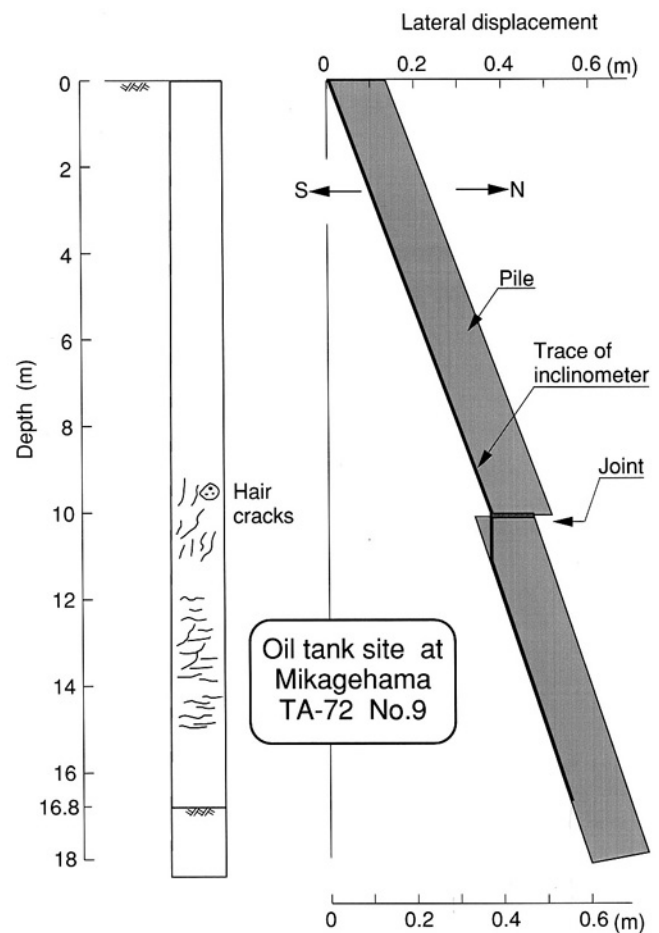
Lateral displacement and observed cracks on the inside wall of Pile No. 9
